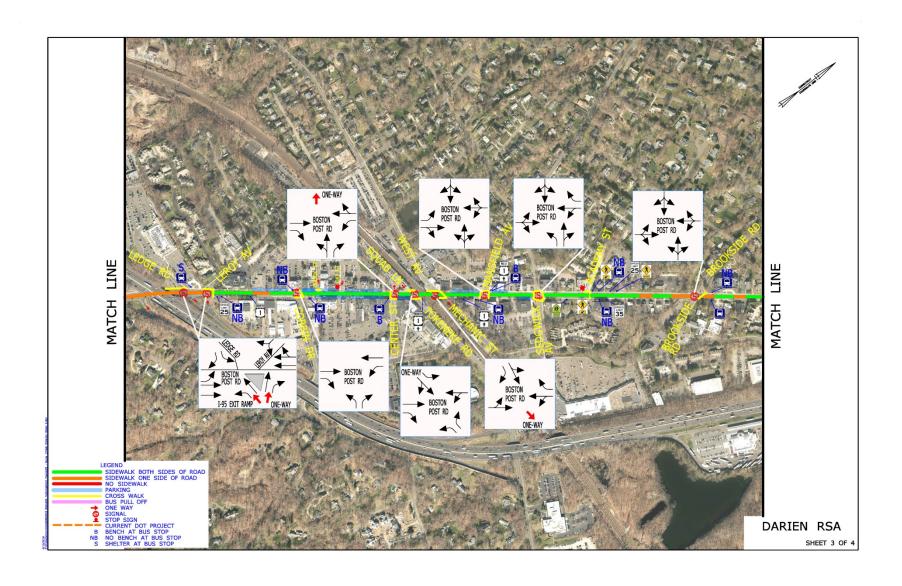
Post Road, Darien Route 1 - Road Geometrics
